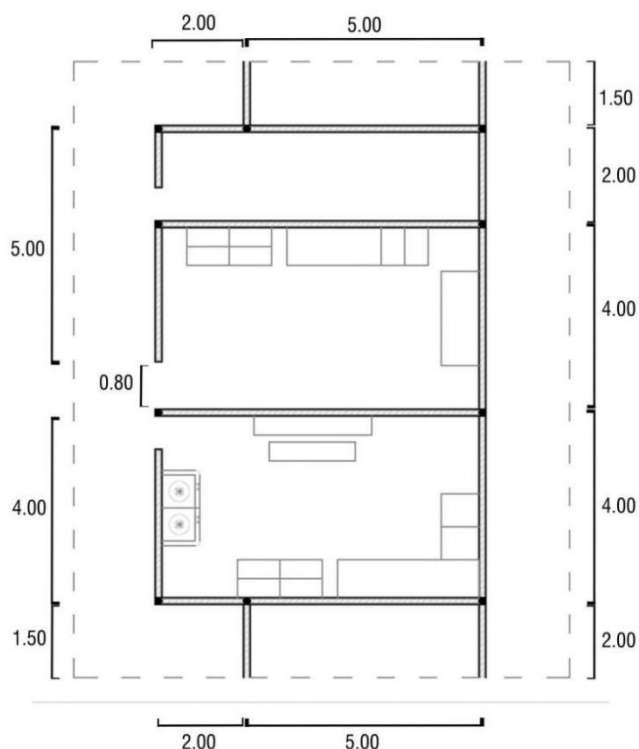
Floorplan of Clinical Nutrition at RSSA Malang
